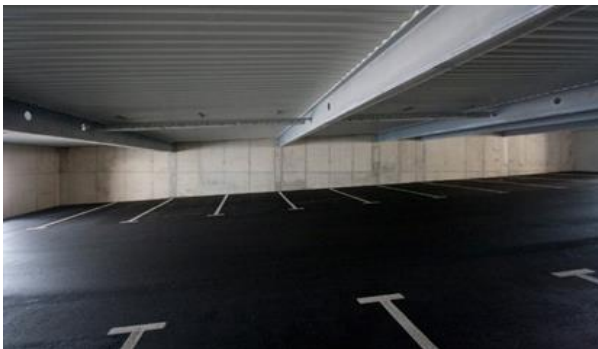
Design of the driveway to level 1 as a parking ramp of an open large garage
